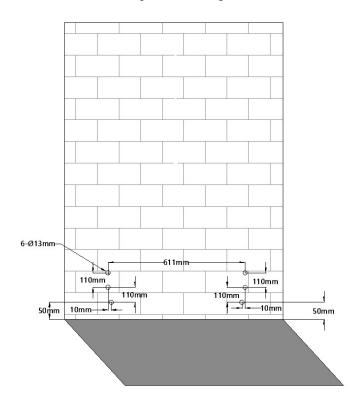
Dimensions of mounting holes on the wall for wall mounting pieces
